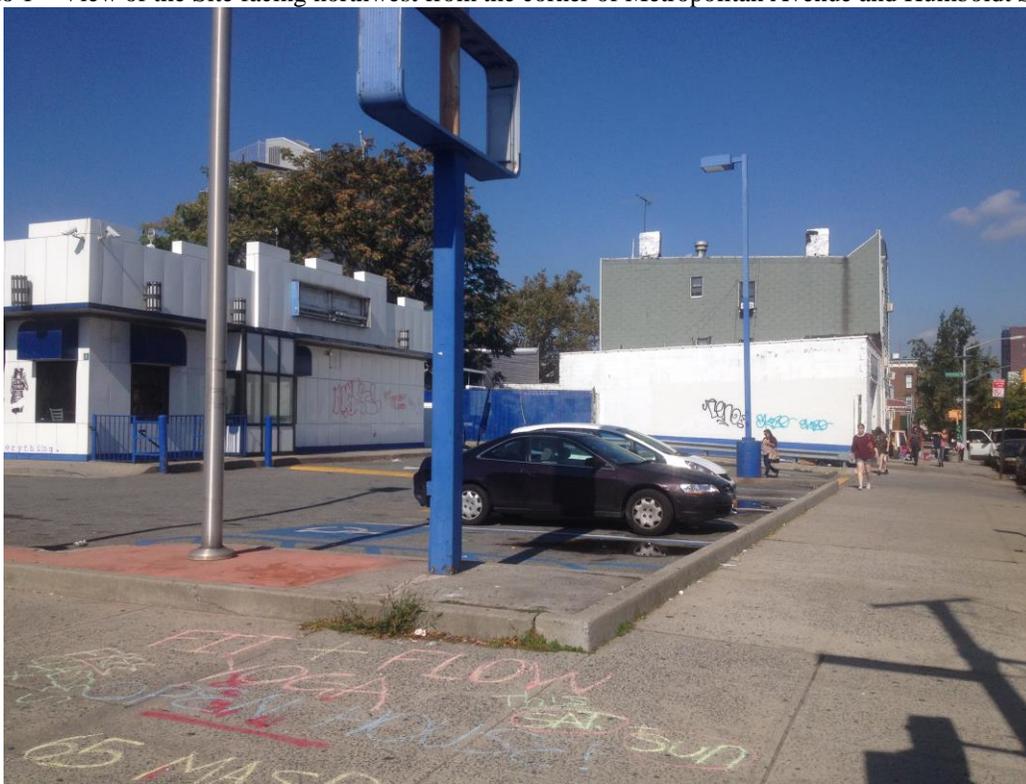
View of the Site facing northeast from the corner of Metropolitan Avenue and Humboldt Street.
